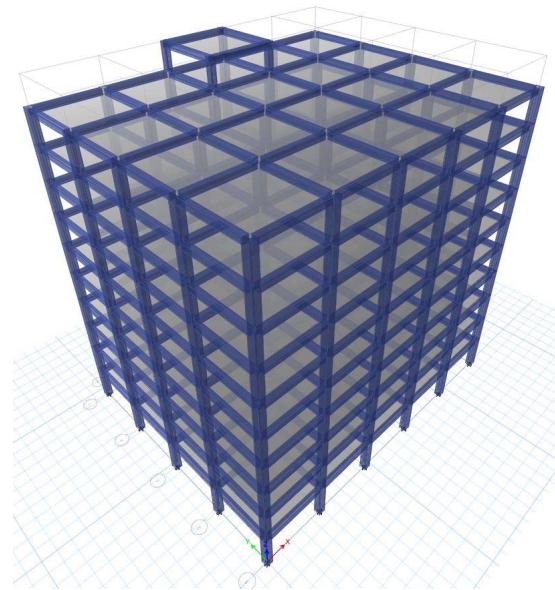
Scheme of the spatial frame of the reinforced concrete building structure with the LRB
